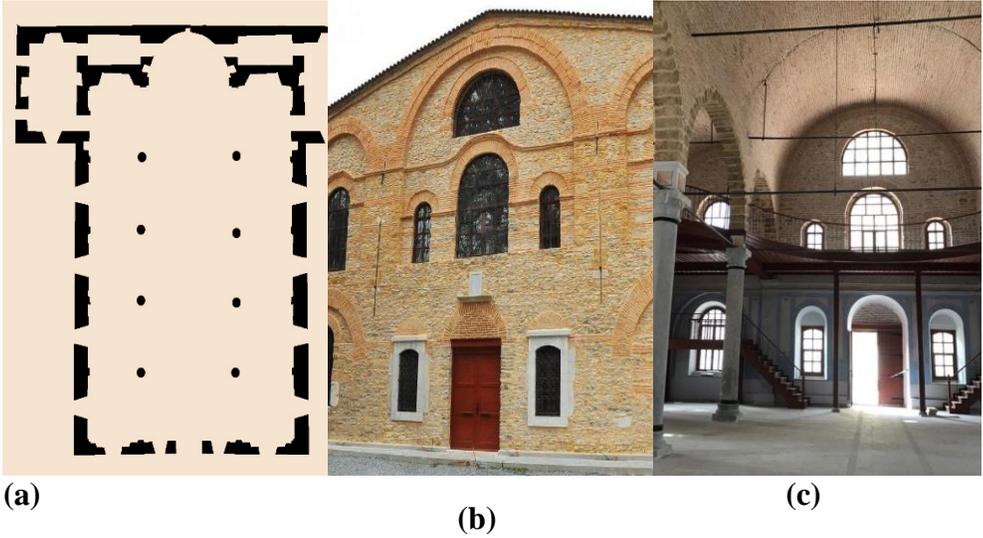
Buildings reflecting the urban characteristics of Akşehir (a- Historical Armenian Church Plan b- Church Facade c- Church Interior (illustration: authors).
